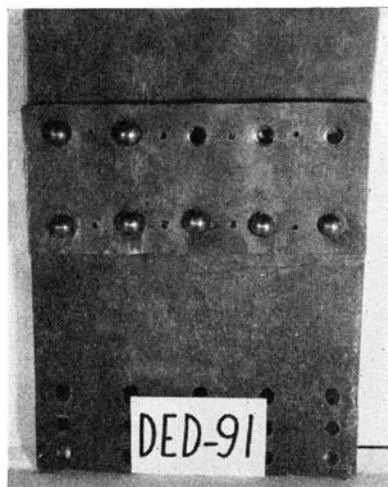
FAILURE BY RIVET SHEAR; DOUBLE-STRAP BUTT JOINT WITH SINGLE ROW OF RIVETS ON EACH SIDE OF JOINT, RIVETS IN DOUBLE SHEAR, SPECIMEN DED-91
